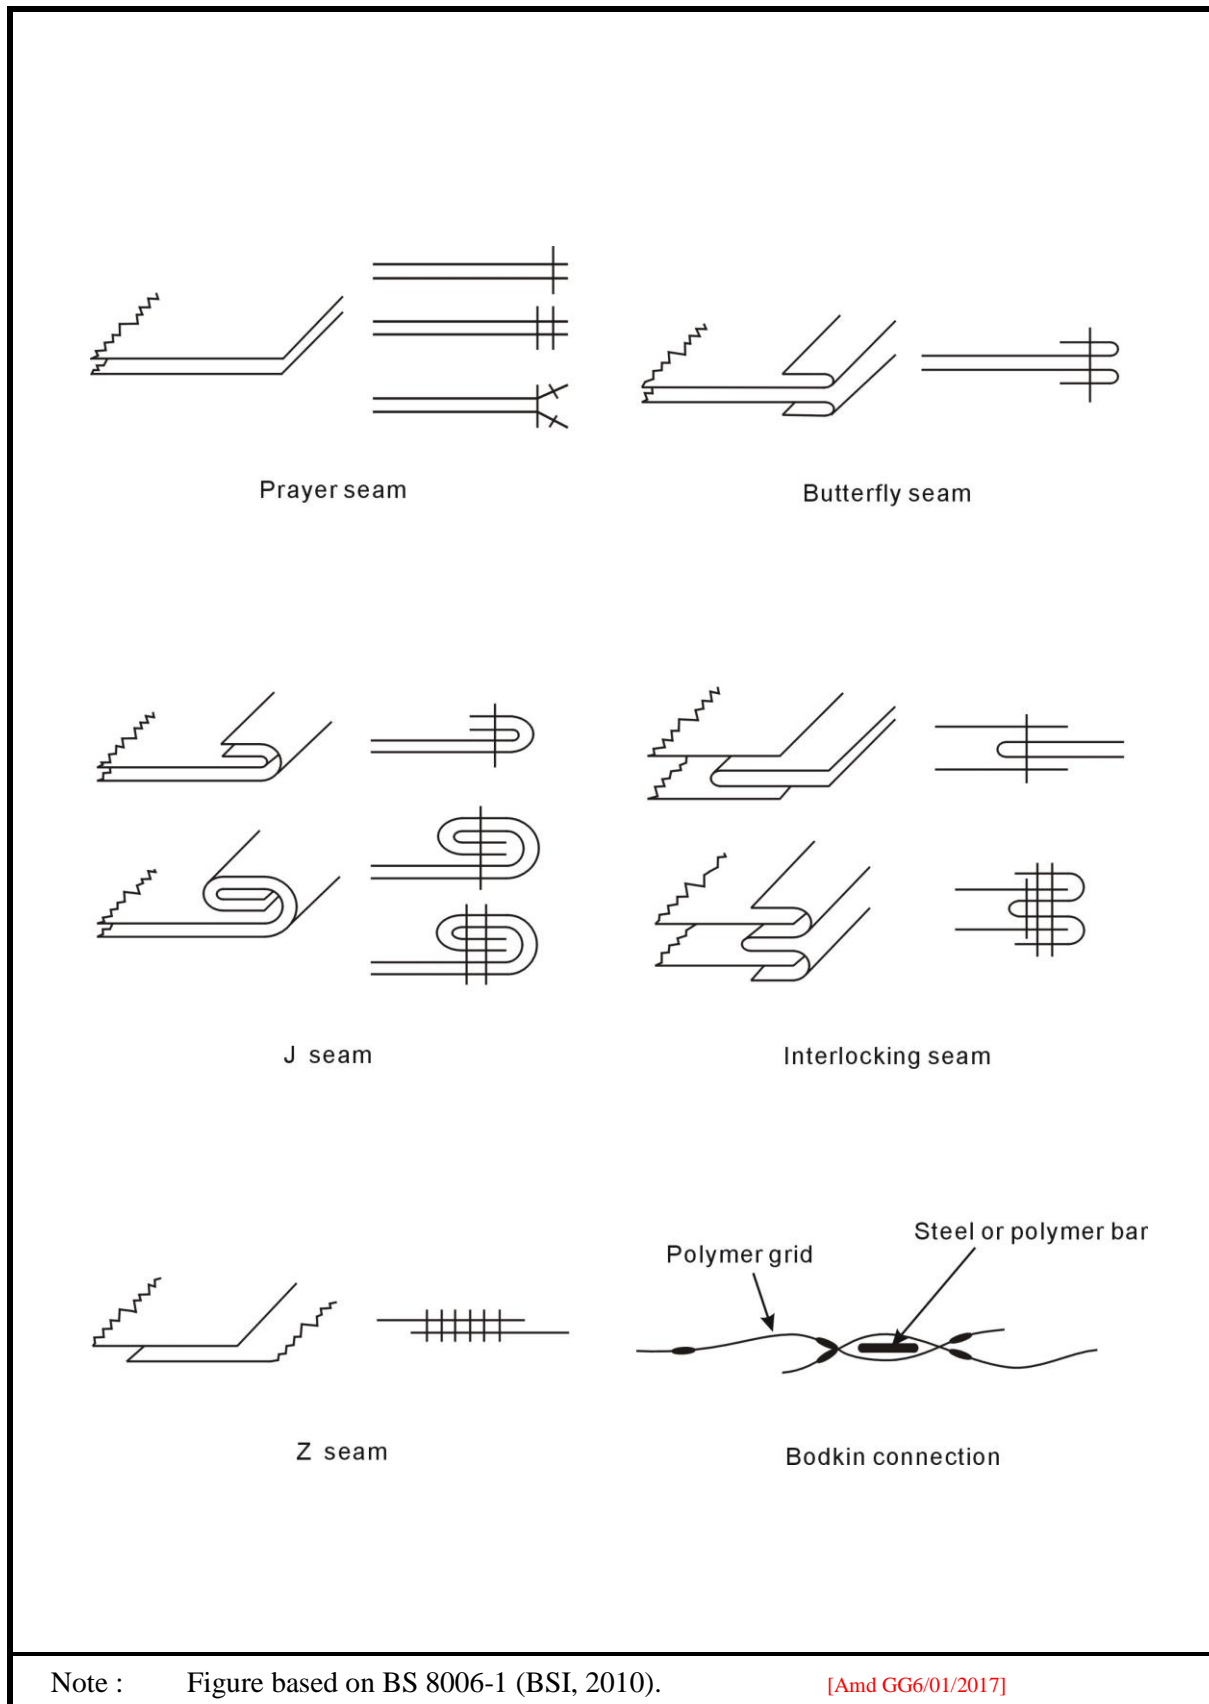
Connections in Geotextiles and Polymeric Reinforcement
